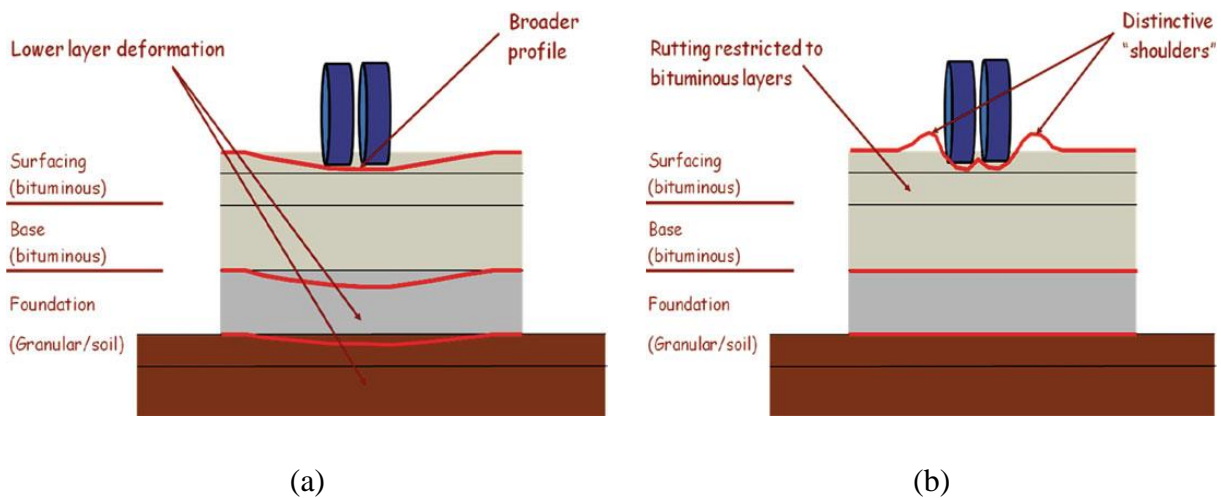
(a) Structural rutting and (b) Non-Structural rutting (Hérve Di Benedetto et al., 2013)
